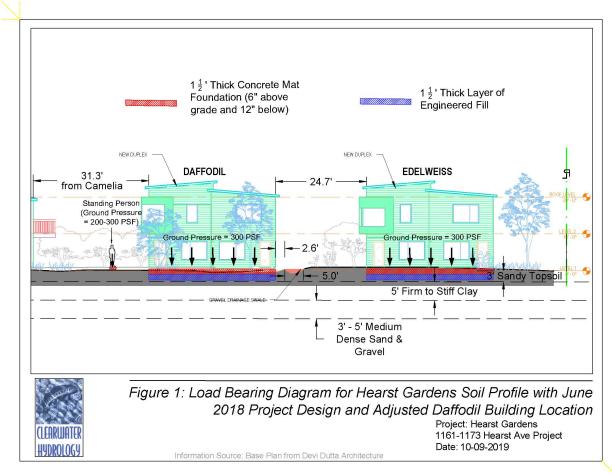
is scaled, and reference to the scale bar shows that the new building foundations do not span the entire site as a single structure, as a dam would. Rather, openings of roughly 15 ft. will exist to either side of these buildings. More importantly, the vertical extents of the engineered fill that would be placed beneath the mat foundations and the overlying mat foundations would not extend to more than 3 ft. below the existing ground. As shown, this depth matches that of the surface soil layer, which is underlain by 3-5 feet of firm clay. Such clay layers are typically considered non-water bearing soil strata and do not readily transmit water vertically, either from the surface via infiltration or from the subsurface via rising groundwater tables.
